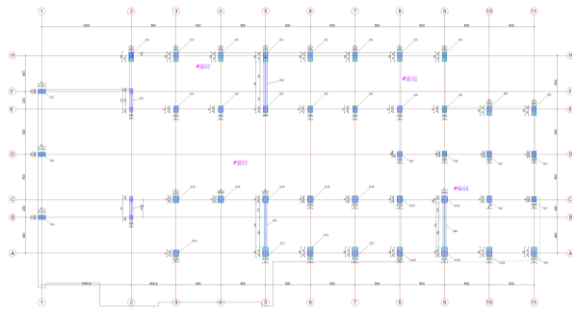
The plan for the reinforced columns and five new RC concrete walls
